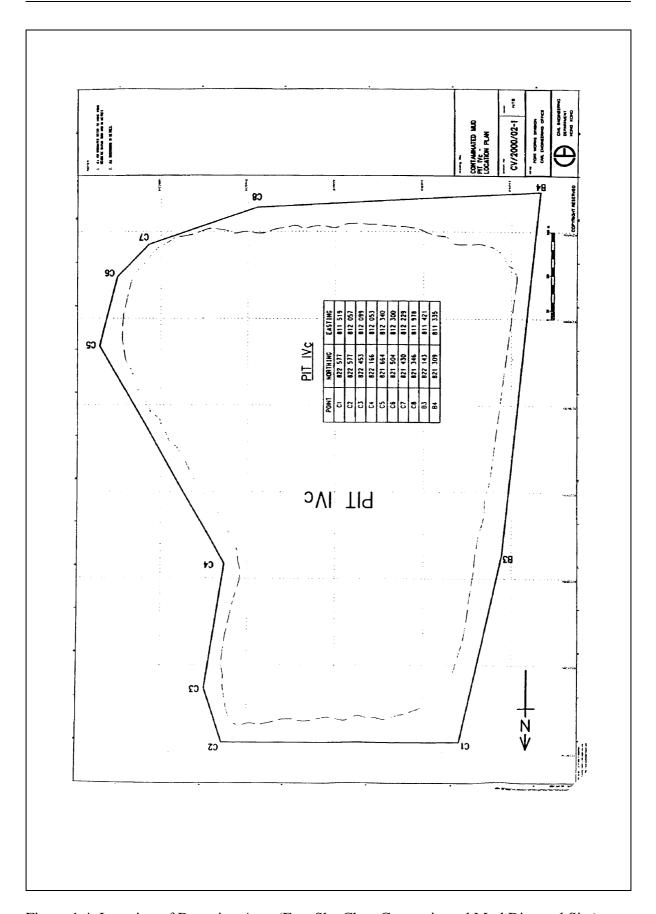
Location of Dumping Area (East Sha Chau Contaminated Mud Disposal Site)
